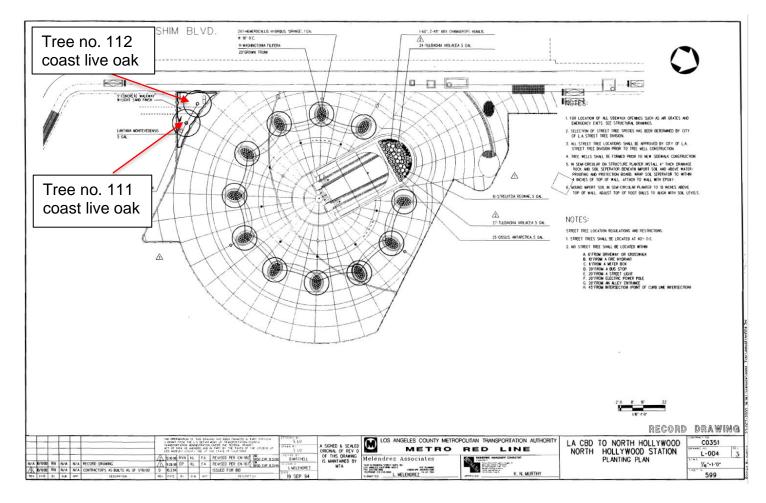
Metro Red Line Planting Plan (September 1994)
